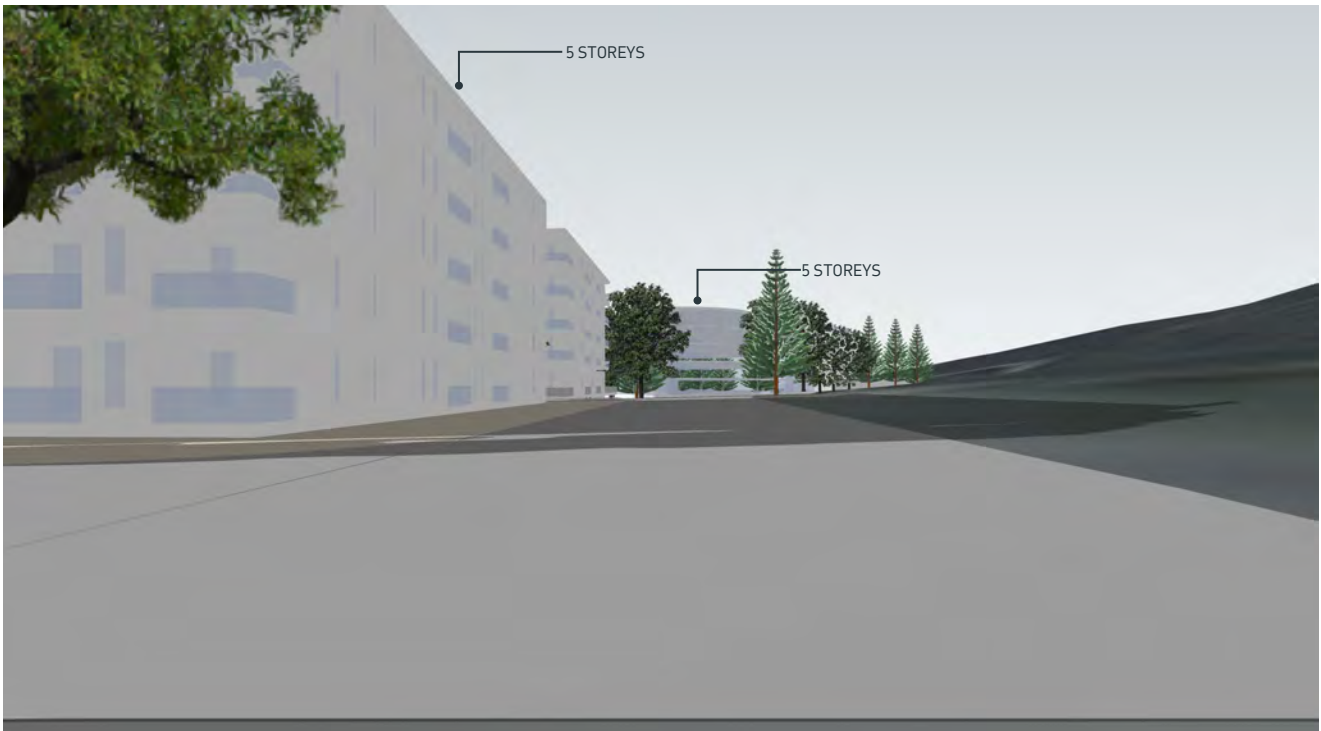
Indicative Built Form (5 Storeys) - Adelaide Crescent looking East
